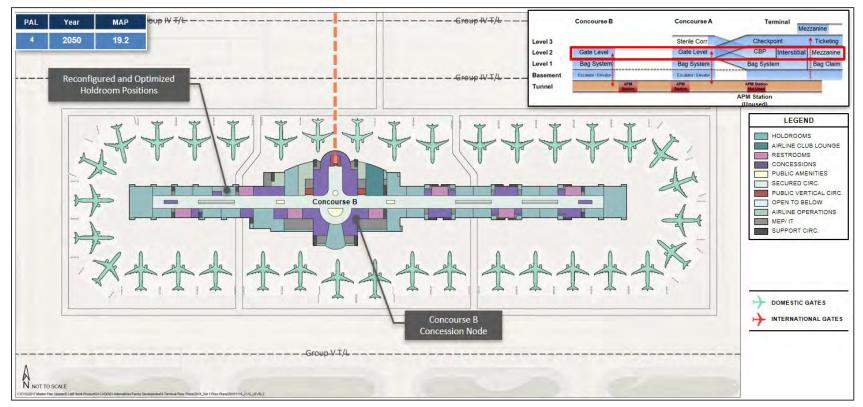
PAL 4 ENLARGED FLOOR PLAN – LEVEL 2 CONCOURSE B
